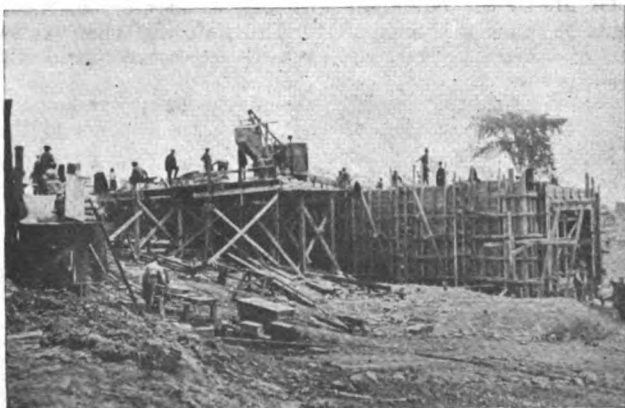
TYPICAL FORM WORK FOR CONCRETE WALL.
